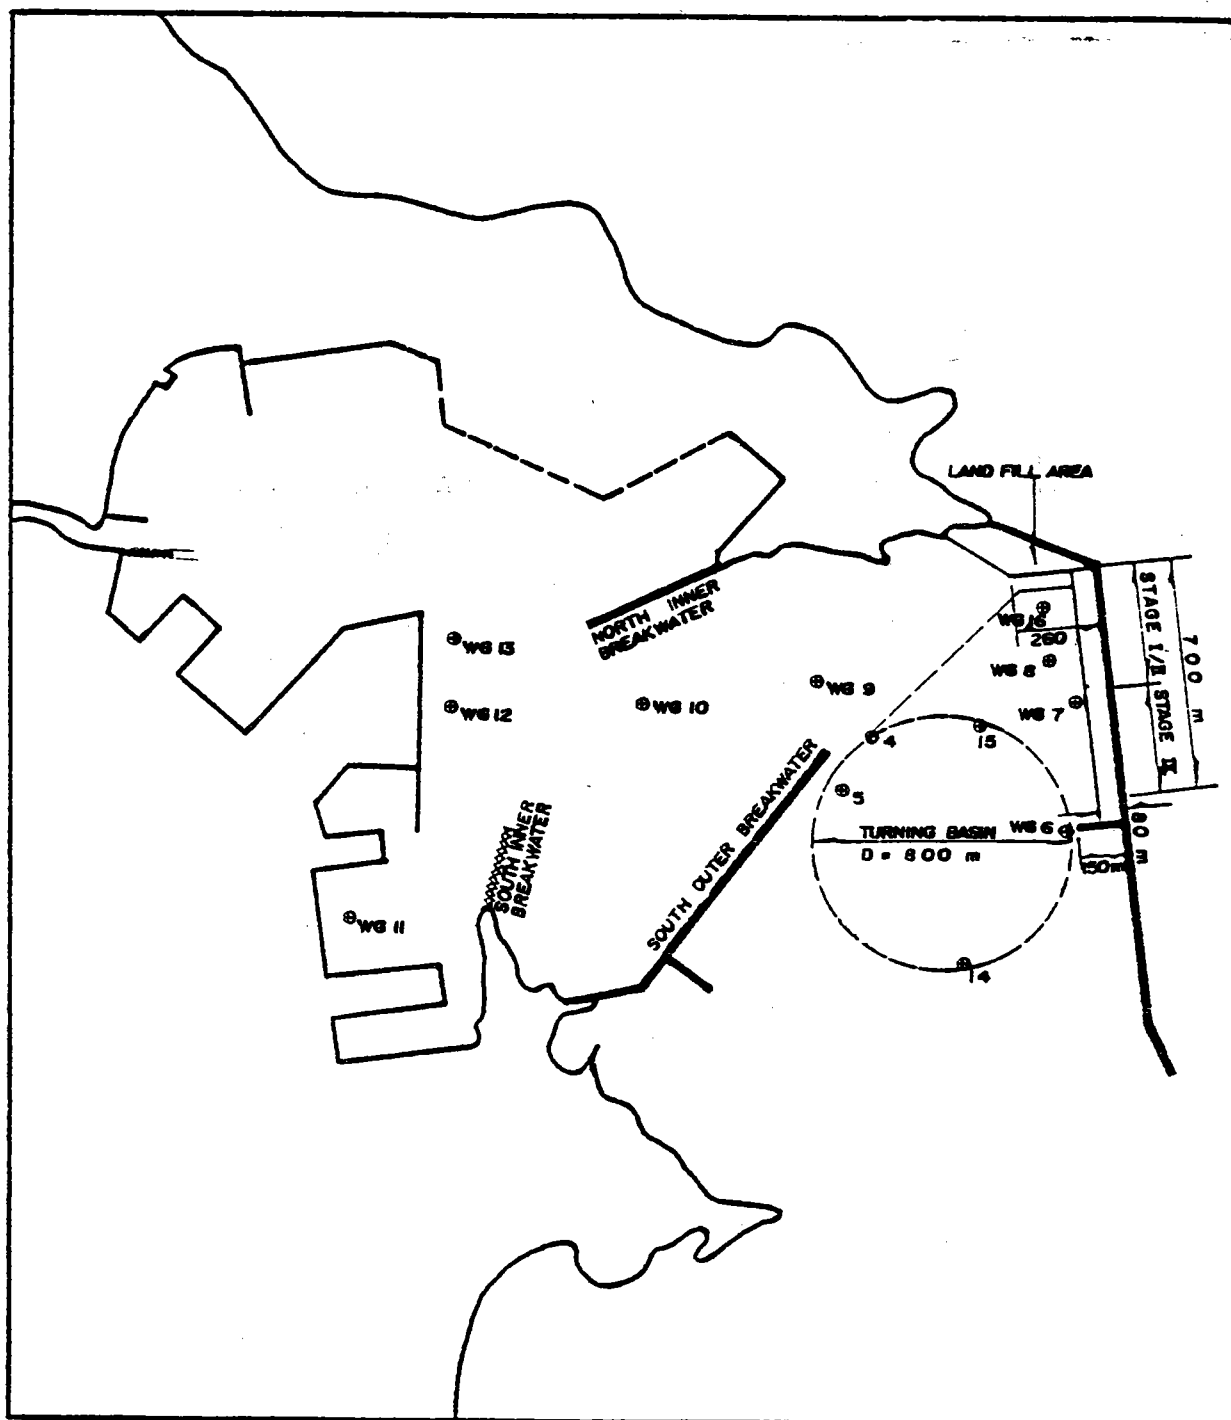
LAYOUT OF THE BREAKWATER TERMINAL
